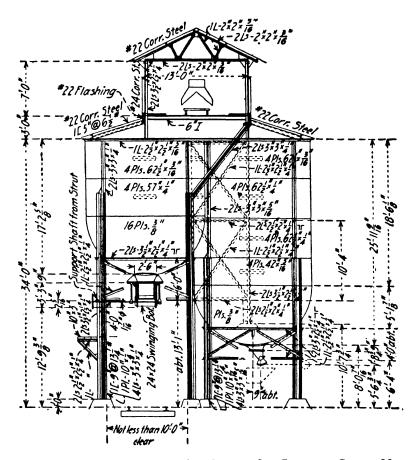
ELEVATION CIRCULAR STEEL ORE BIN FOR OLD DOMINION COPPER MINING CO.
